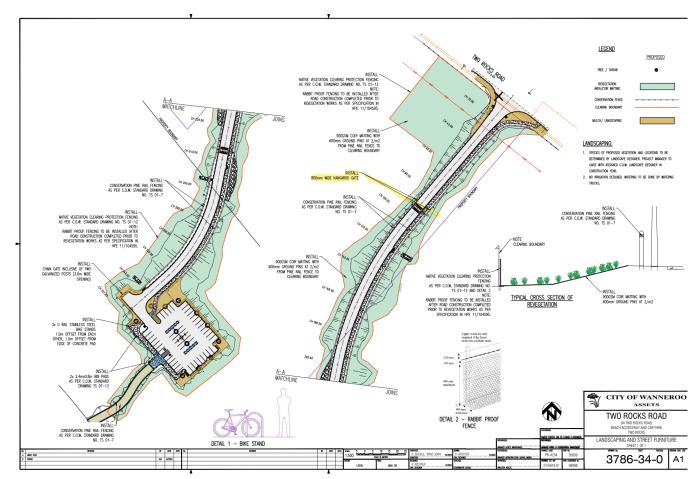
City of Wanneroo's design plans for the two rocks road kangaroo fence location.
